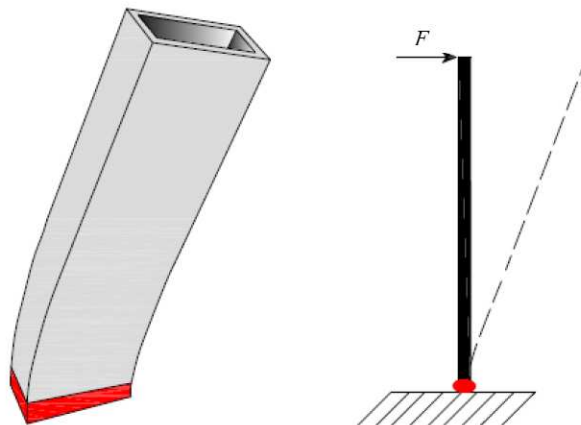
Plastic hinge development at the bottom of a pier subjected to horizontal load.
